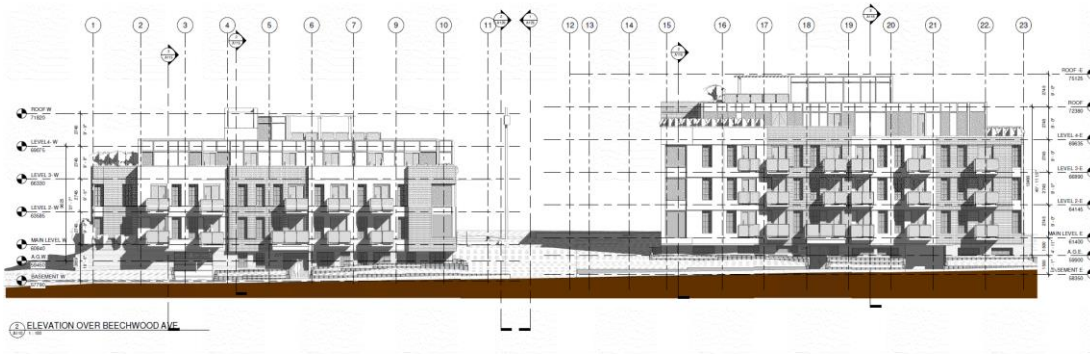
East and west Elevations. Source Woodman Architecture 2022.
